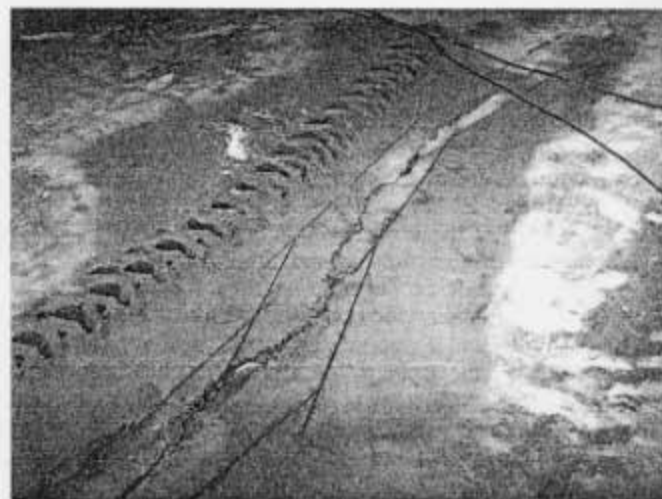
(a). Crack Repaired by Cutting 150 mm (6 in.) by 75 mm (3 in.) Trench in Existing Pavement, then Filling with Asphalt Concrete
